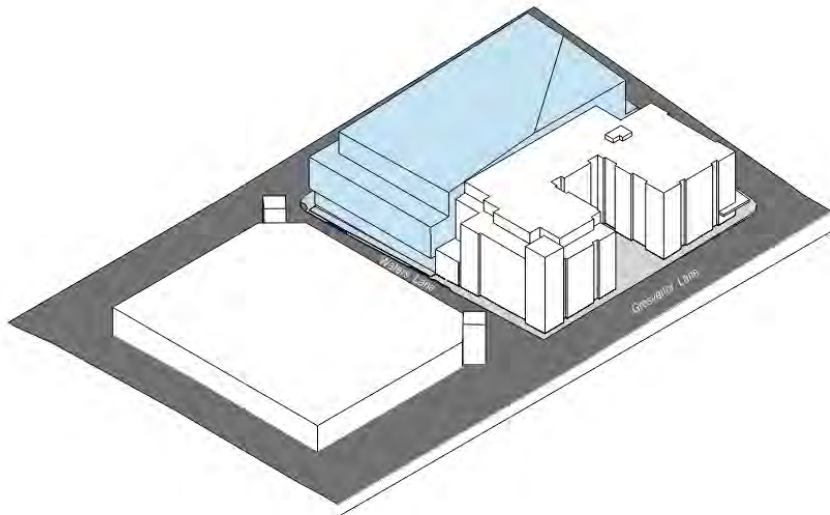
Permitted Building Envelope looking north-east (source: SJB Architects)
